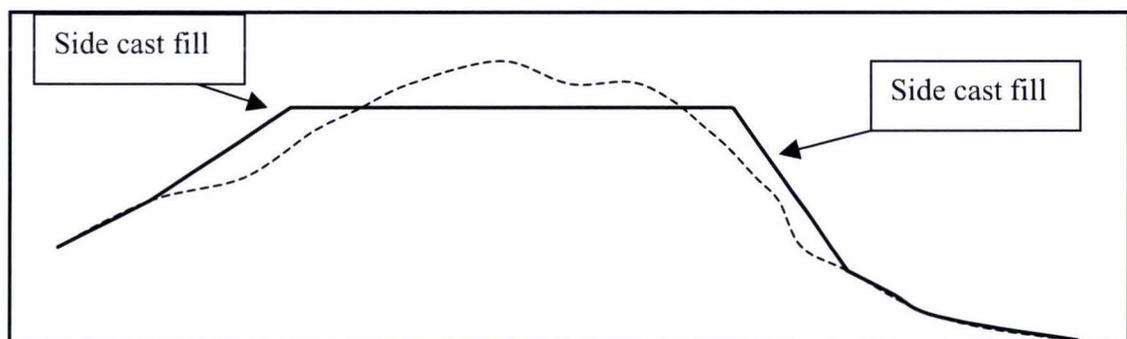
Ridge top excavation to form a road, skid trail or landing site.
